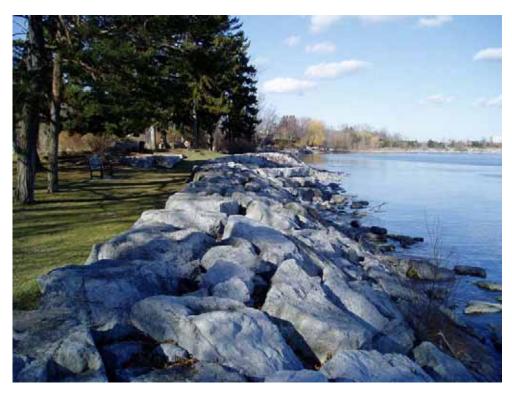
Adamson Estate – Armourstone revetment at west end of park
